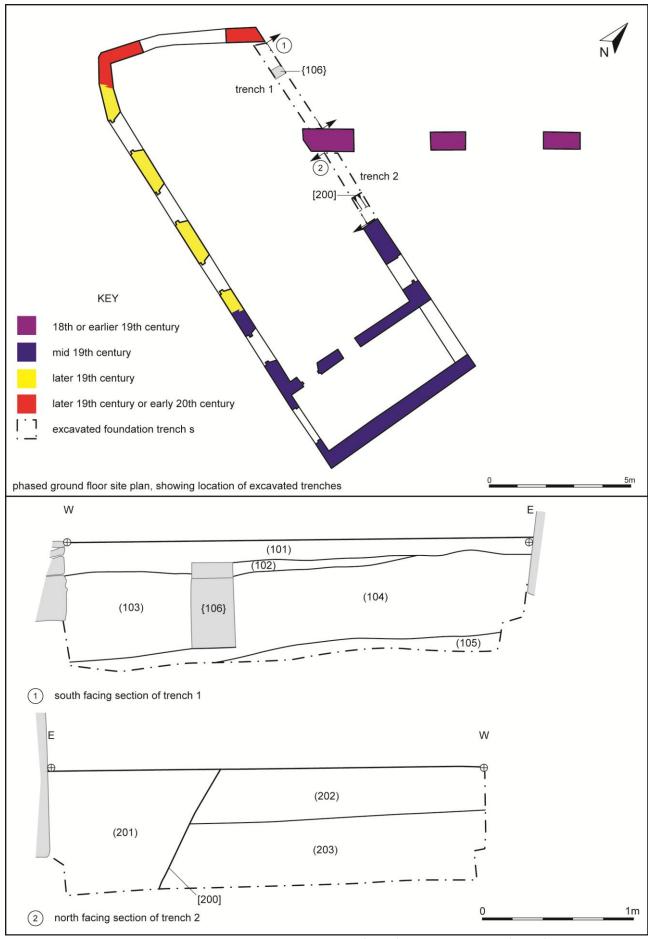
PHASED PLAN OF THE BUILDING WITH TRENCH LOCATIONS INDICATED (ABOVE) AND TRENCH SECTIONS (BELOW).
